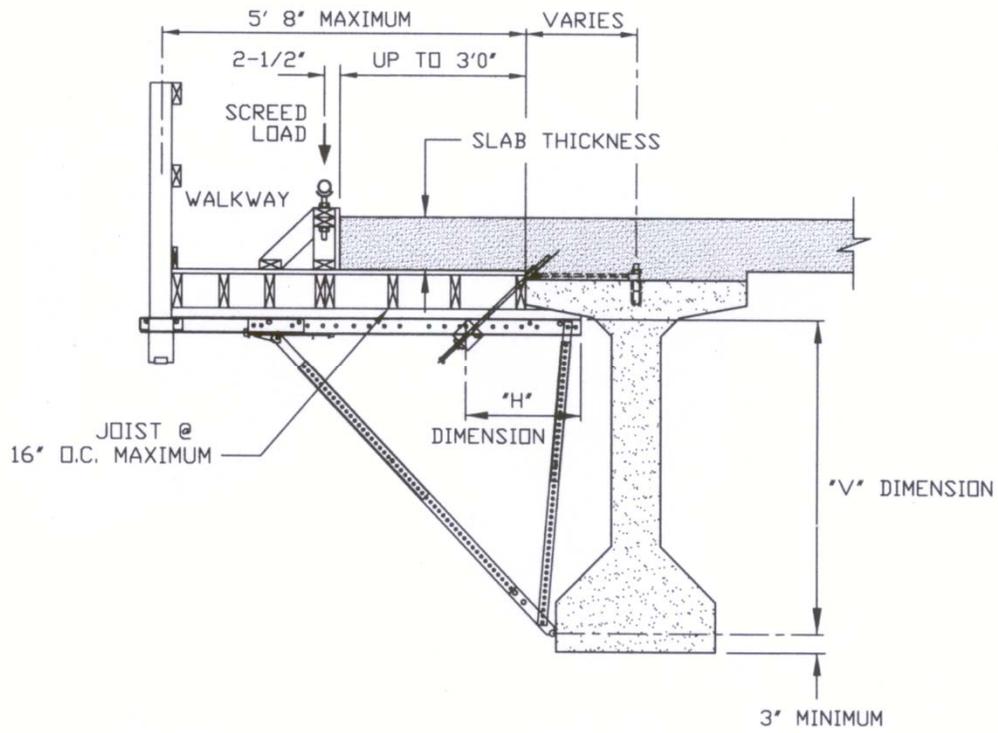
Diagram of HF-86 installed on bulb tee (Meadow Burke Road & Bridge Catalog, 2006)
